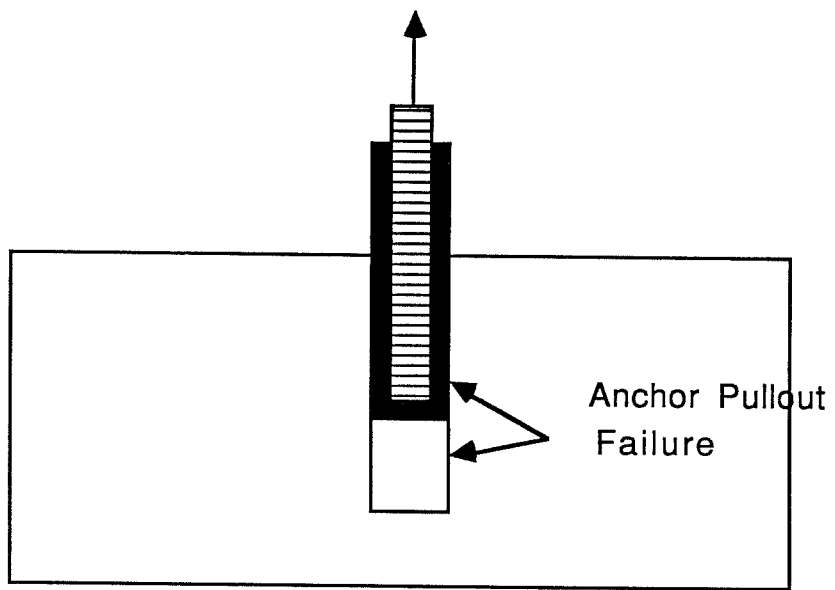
Failure Modes for Adhesive and Grouted Anchors
